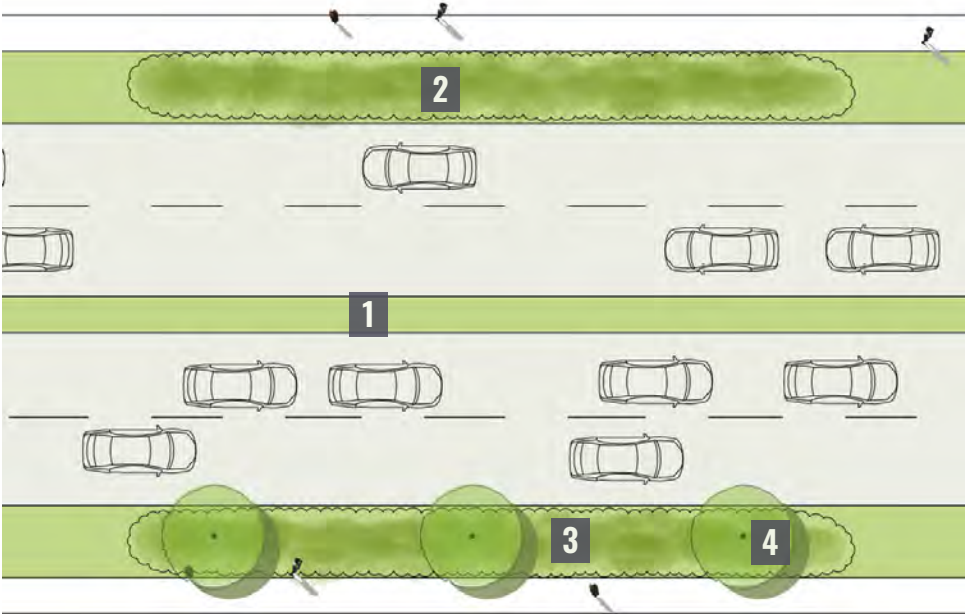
PLAN VIEW OF GREEN STREET RETROFITS ALONG NANNIE HELEN BURROUGHS AVENUE
